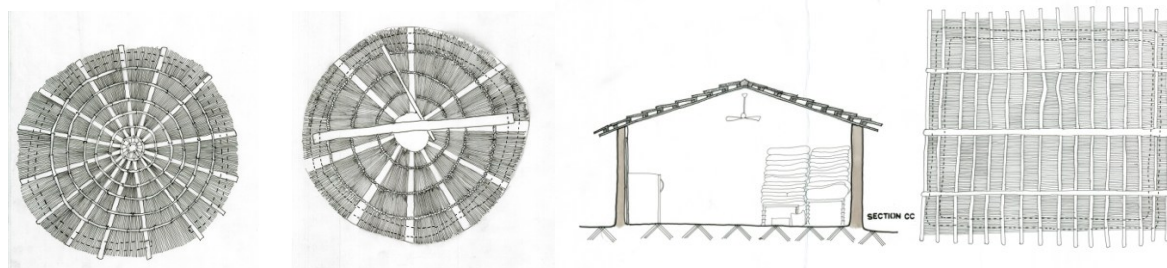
Roof details of houses in Zararwadi in Hodko, Kutch, Round roof (left) and polygon roof (right) (created by the Author)
